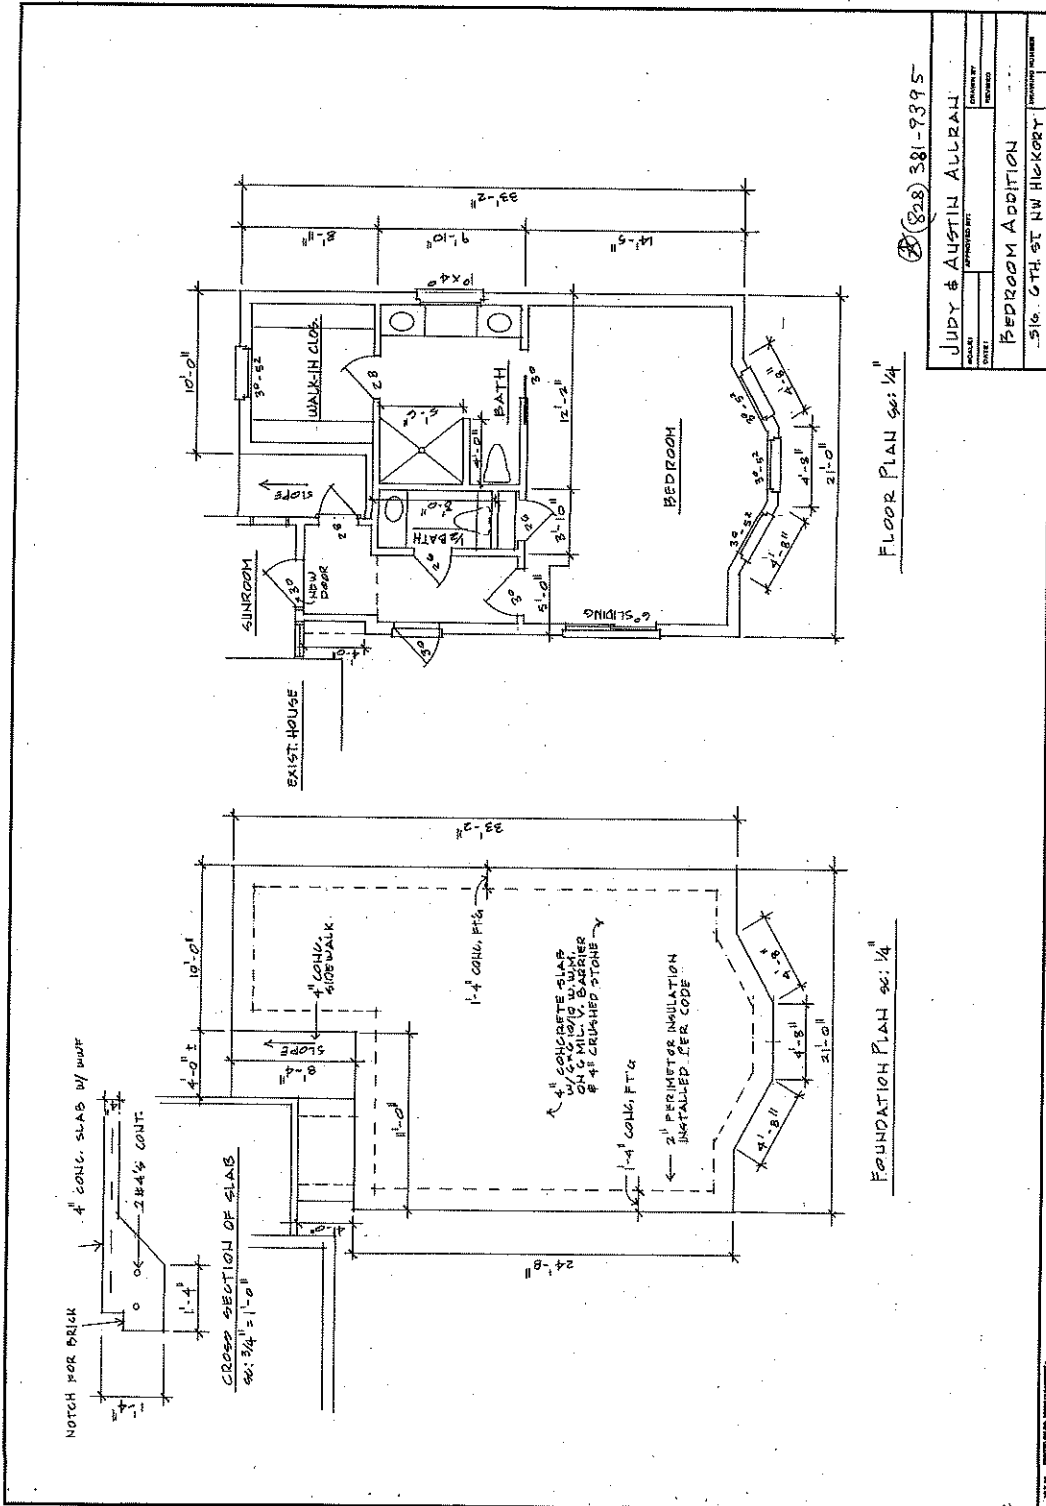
Applicant provided site plan. Note location of the bay windows to the rear.
